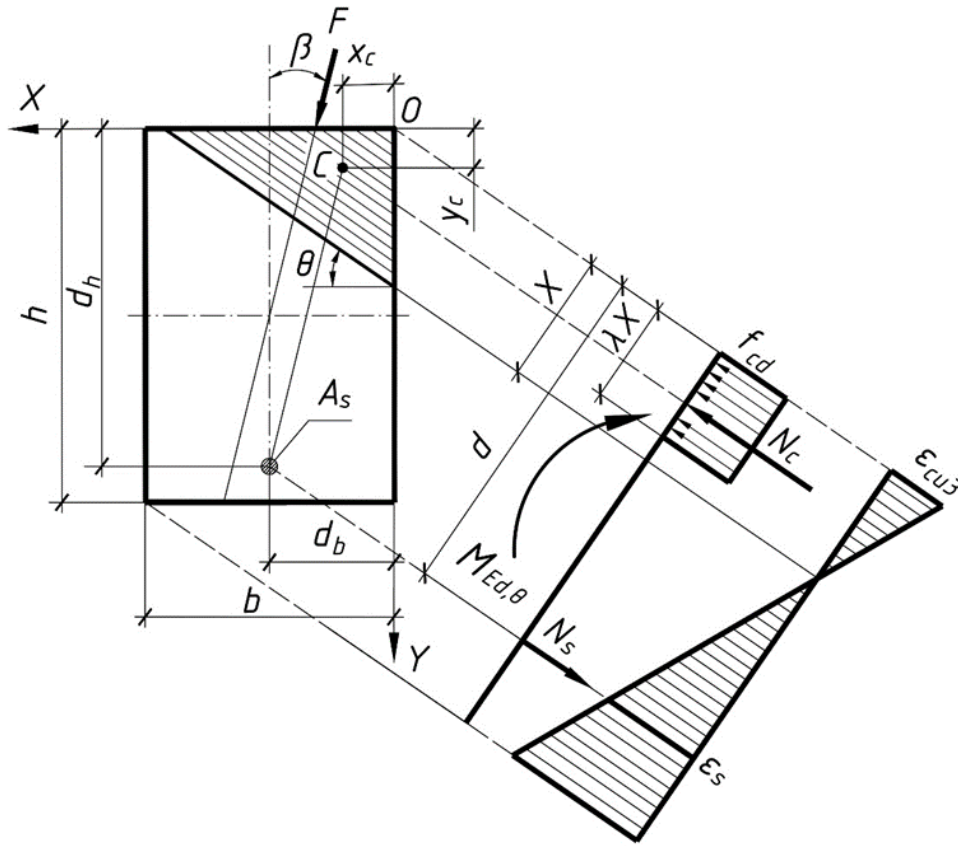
Design diagram of the cross-section of the biaxially bended member with a triangular form of a compressed concrete area
